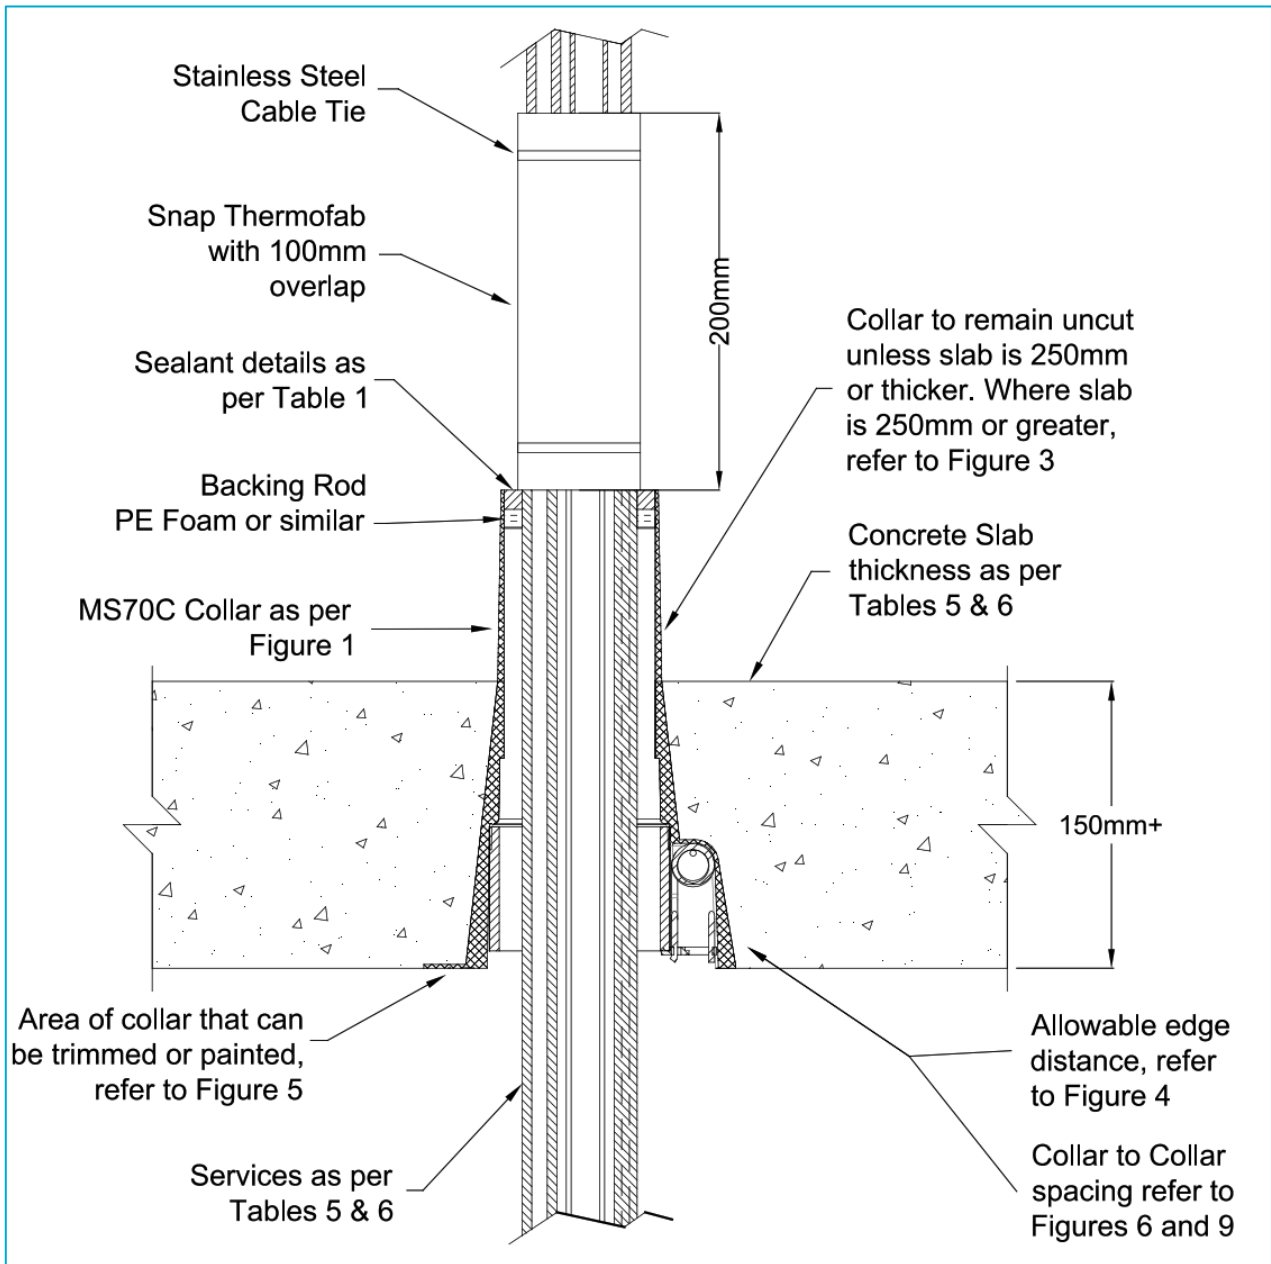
Standard installation of MS70C Collar in concrete floor with the addition of Snap Thermofab
